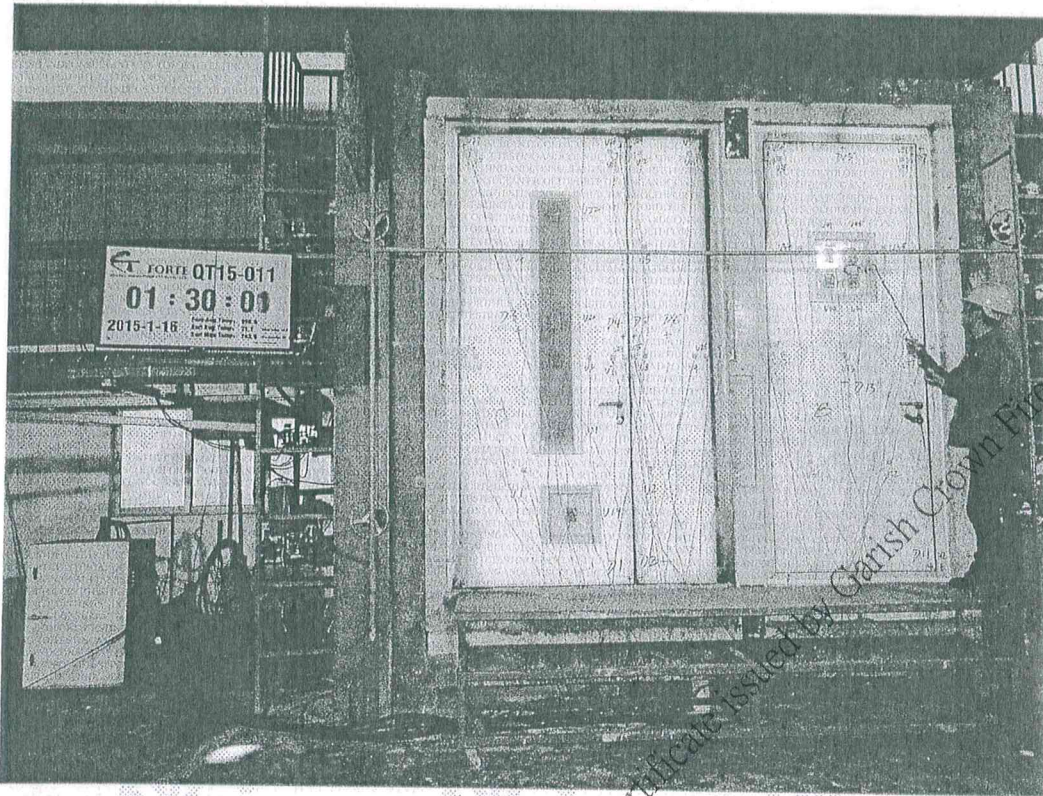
Unexposed surface of the specimen at 90 minute of test.
